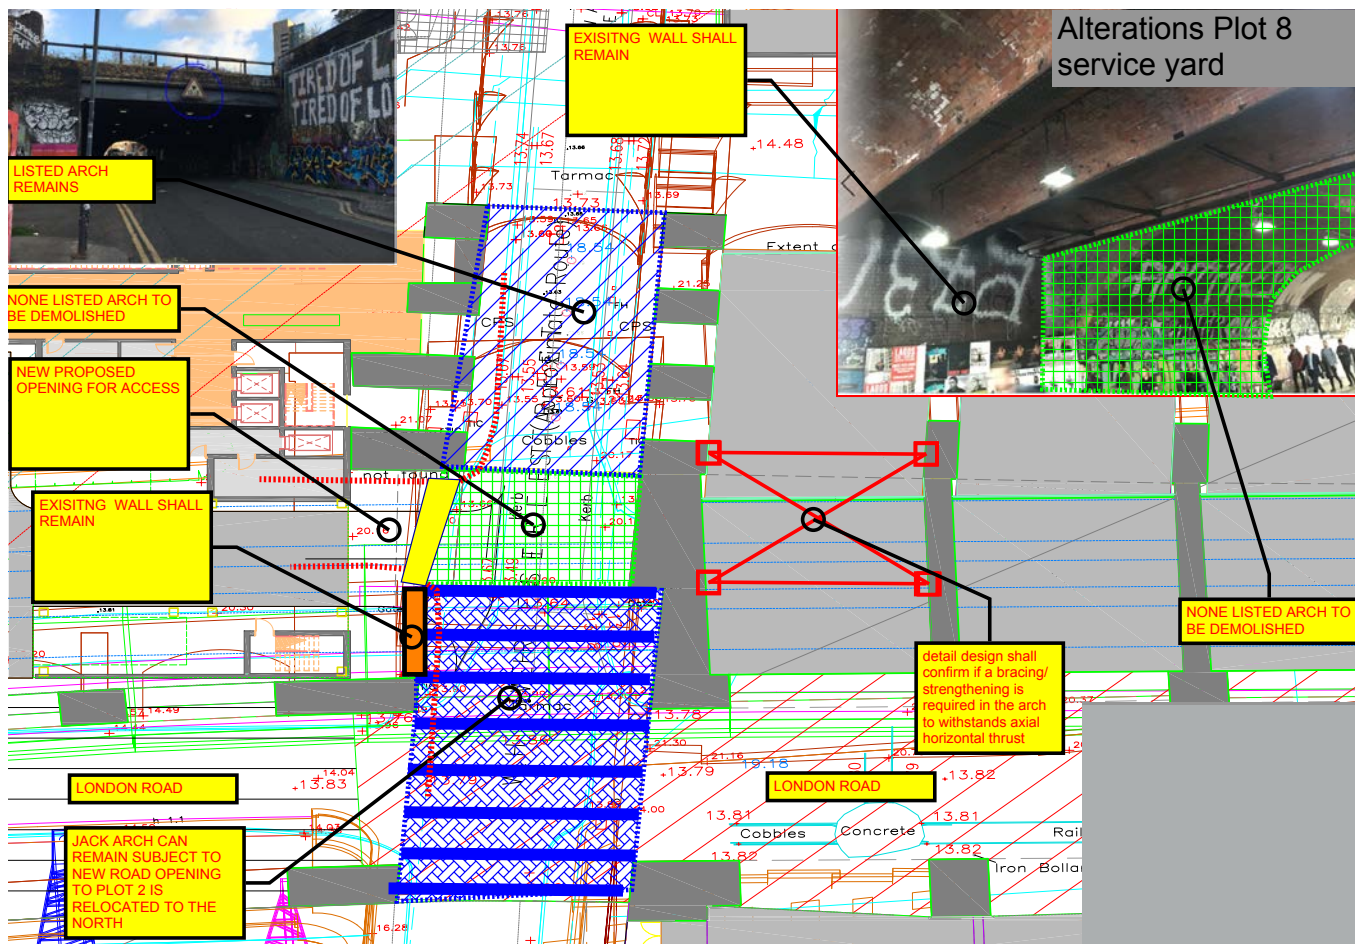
Plan indicating structural strategy to listed retained and demolished non-listed
